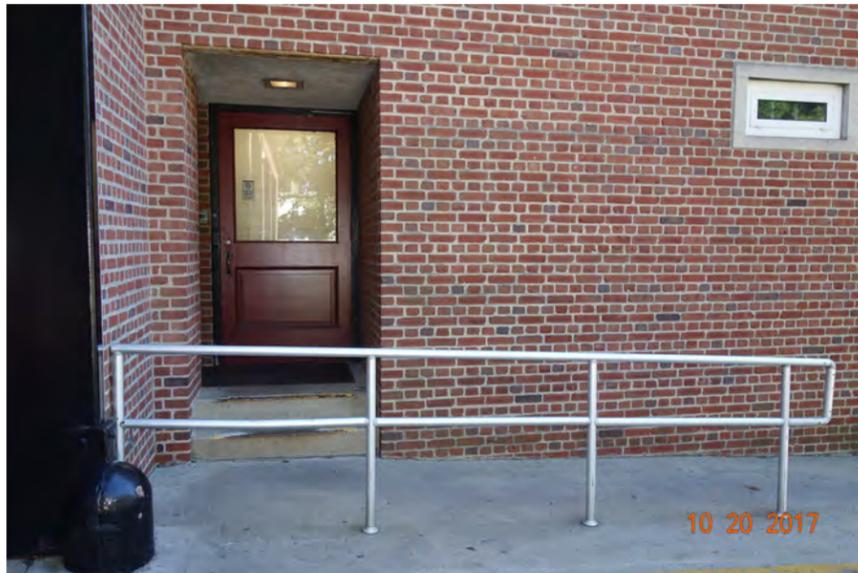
1 Exterior Entrance - Walkway Not Accessible
